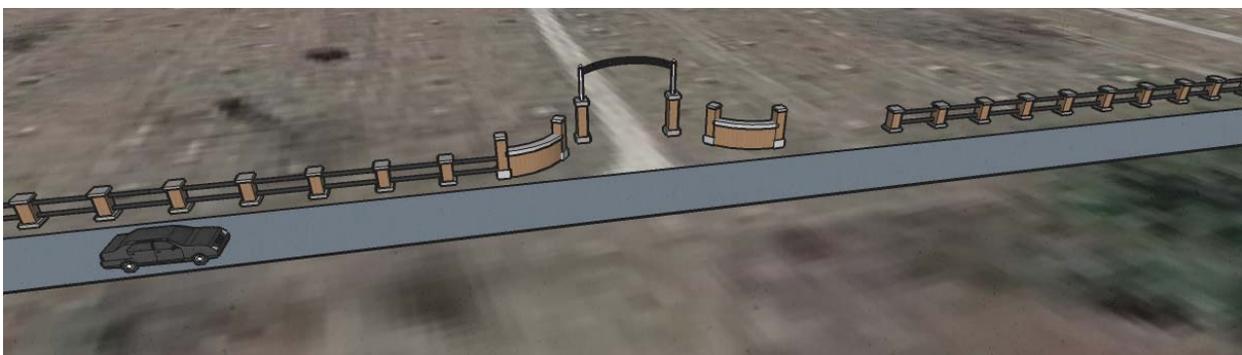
B—To preserve the integrity of the Cemetery and to improve aesthetics, a fence will be installed along the Cemetery/road edge and a central wall and archway feature added.
